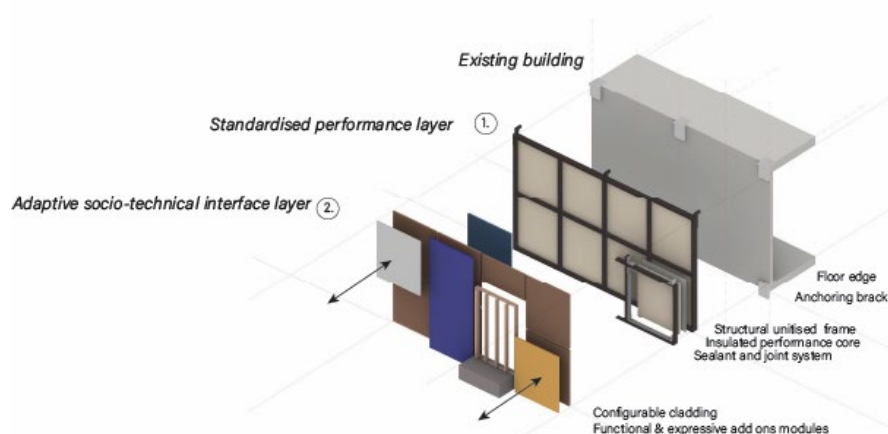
Exploded view of two layered system of VIMFS including the components.
